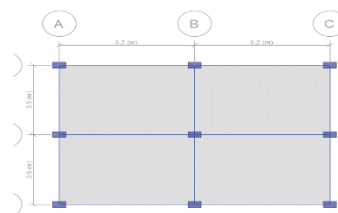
(a): plan view 30<sup>0</sup> inclination
